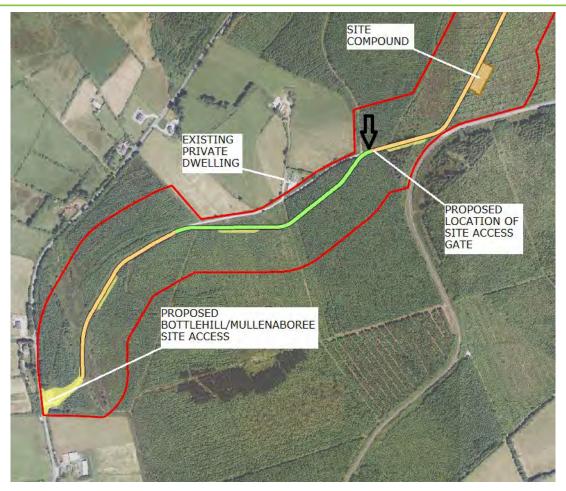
Bottlehill and Mullenaboree Site Access: Proposed Gate Location
